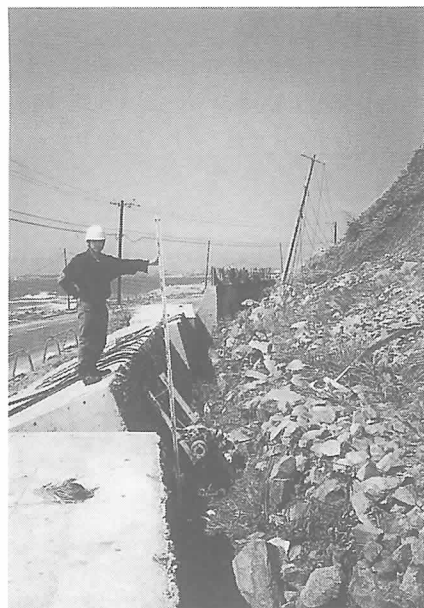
Collapsed road retaining wall caused by retreating tsunami (concrete retaining wall, Matsumae in Okushiri)
